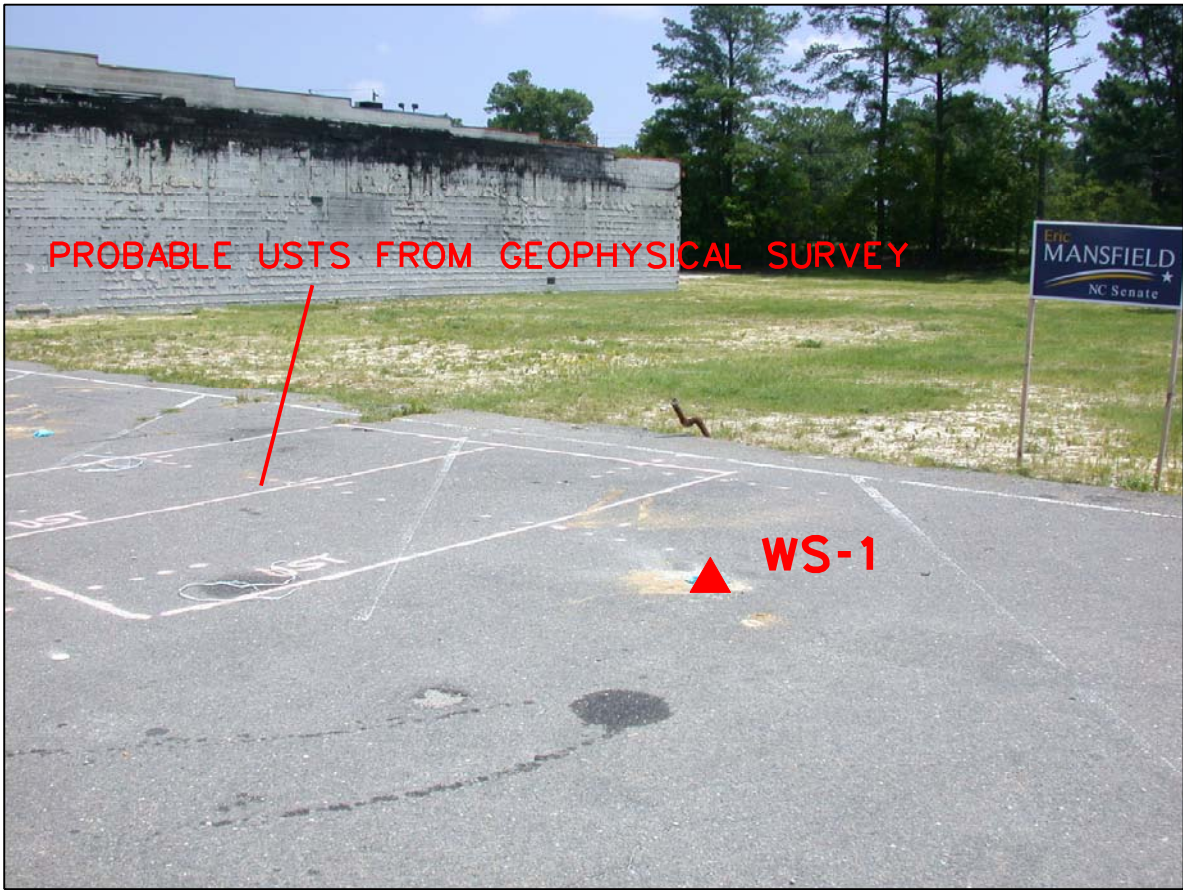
BORING IN PROPOSED R/W LOOKING NORTHEAST
